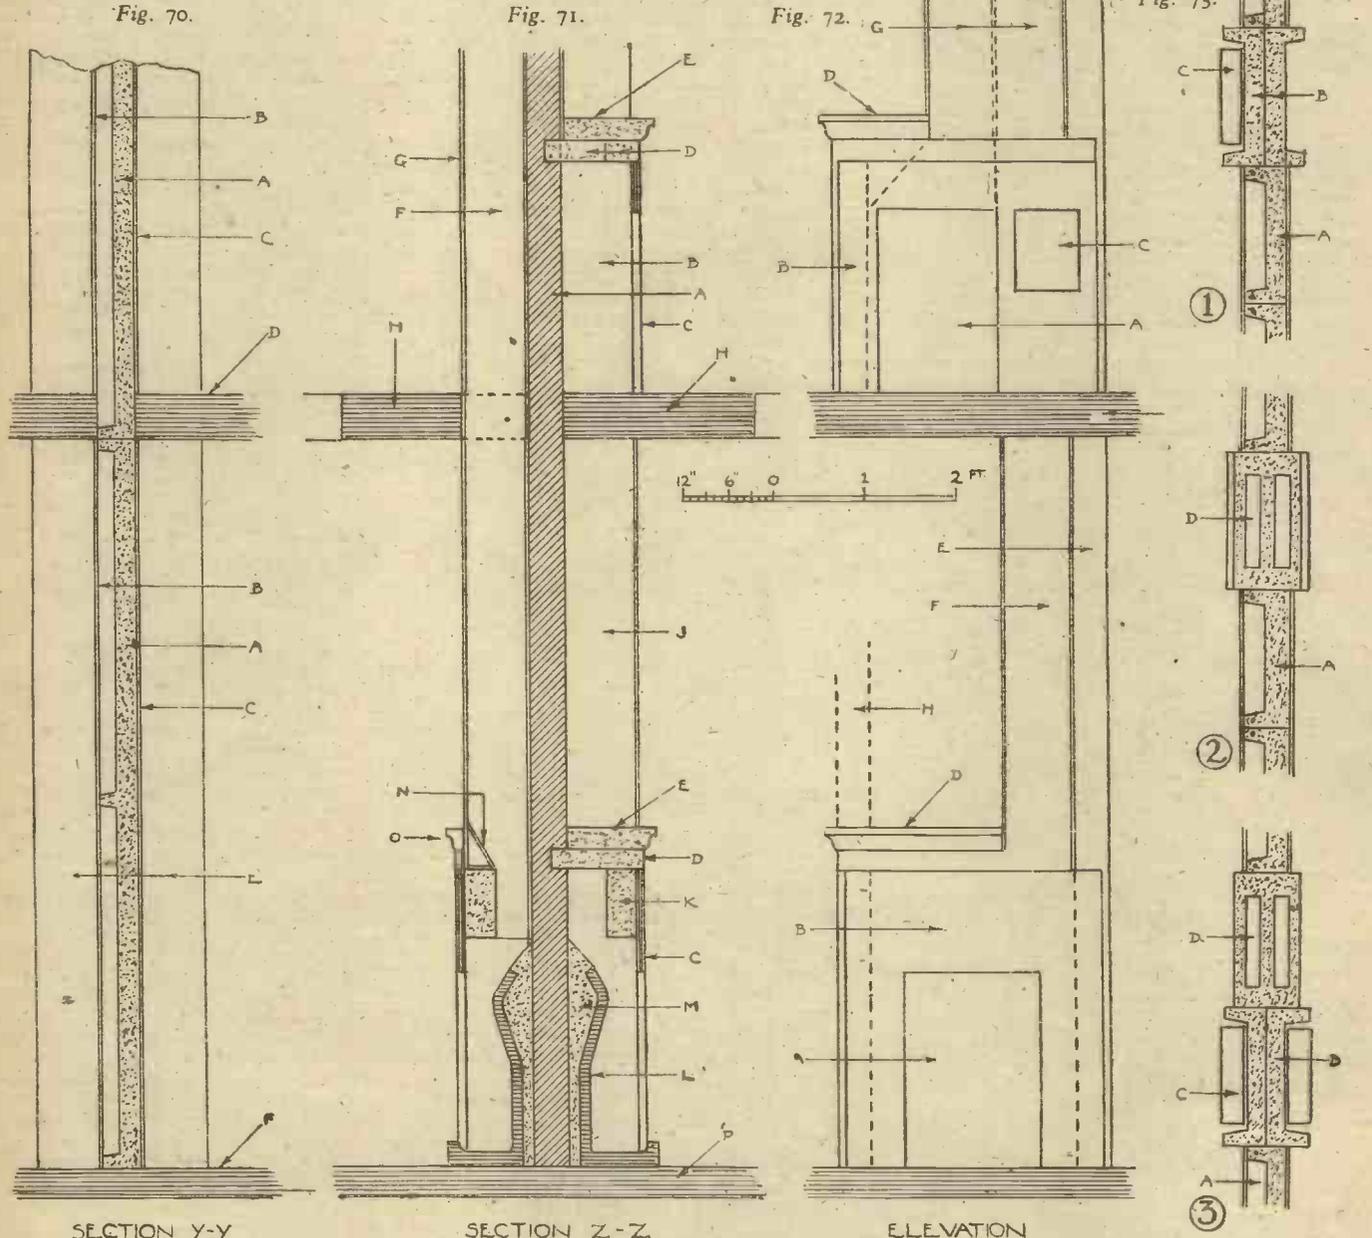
Section through party wall shown by Fig. 66. A—Concrete pre-built party wall units. B—Insulated wall covering or finish with hollow space behind. C—Insulated wall covering or finish applied to solid part of concrete units. D—First floor. E—Side of fireplace. F—Ground floor. Fig. 71.—Section through fireplaces and chimney breast shown in plan by Figs. 66 and 69. A—Fireplace back. B—Fireplace opening. C—Surround. D—Structural concrete slab over opening with aperture to take metal throat of flue. E—Concrete (or other material) shelf. F—Metal flue and radiator as before described. G—Face of flue. H—First floor and hearth. J—Side of flue. K—Concrete lintol. L—Firebrick back. M—Fine concrete filling. N—Flue shaped to form throat over fireplace opening. O—Shelf in distance. P—Ground floor. Fig. 72.—Elevation of fireplaces and space-saving flue and breast construction. A—Fireplace openings. B—Tiled or sheet material surround to opening. C—Electric fire. D—Shelf. E—Brick (or concrete) jamb. This may be omitted if desired and is not required for any superstructure. F—Face of flue. G—Twin flues. H—A brick jamb can be built here if desired for any structural purpose. Fig. 73.—Plans of party wall with gas fire openings and flues. 1—Ground floor level. 2—Gas fire flues in ground storey. 3—First floor level. A—Pre-built party wall units. B—Gas fire openings. C—Gas fire. D—Flue blocks.
